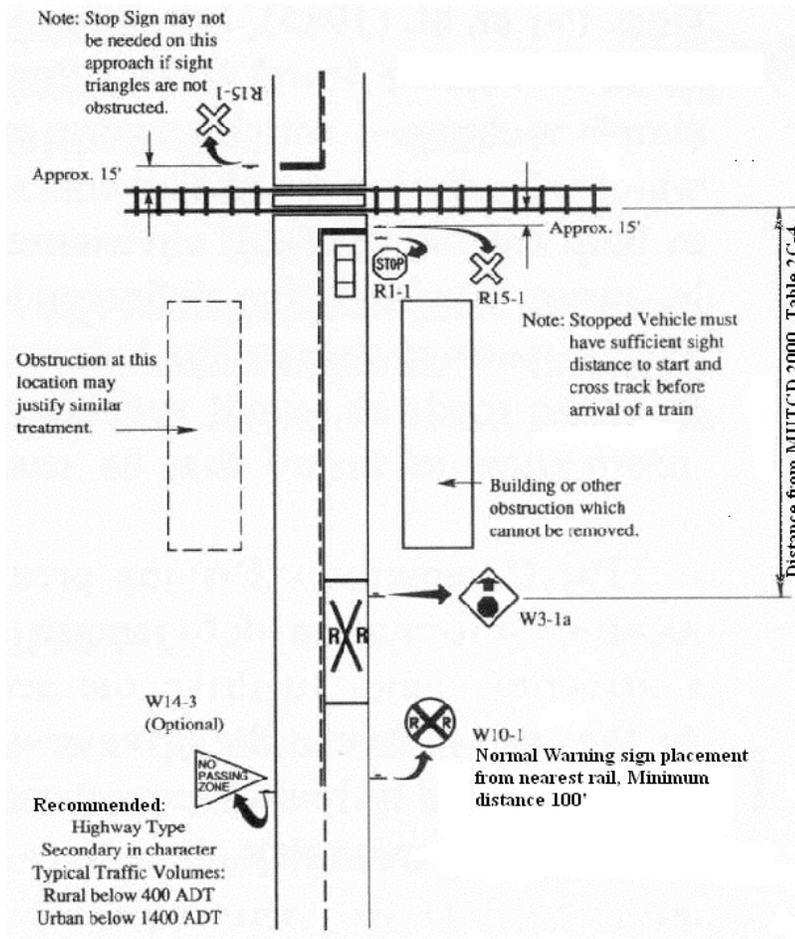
Example Application of a Stop Sign at a Crossing
